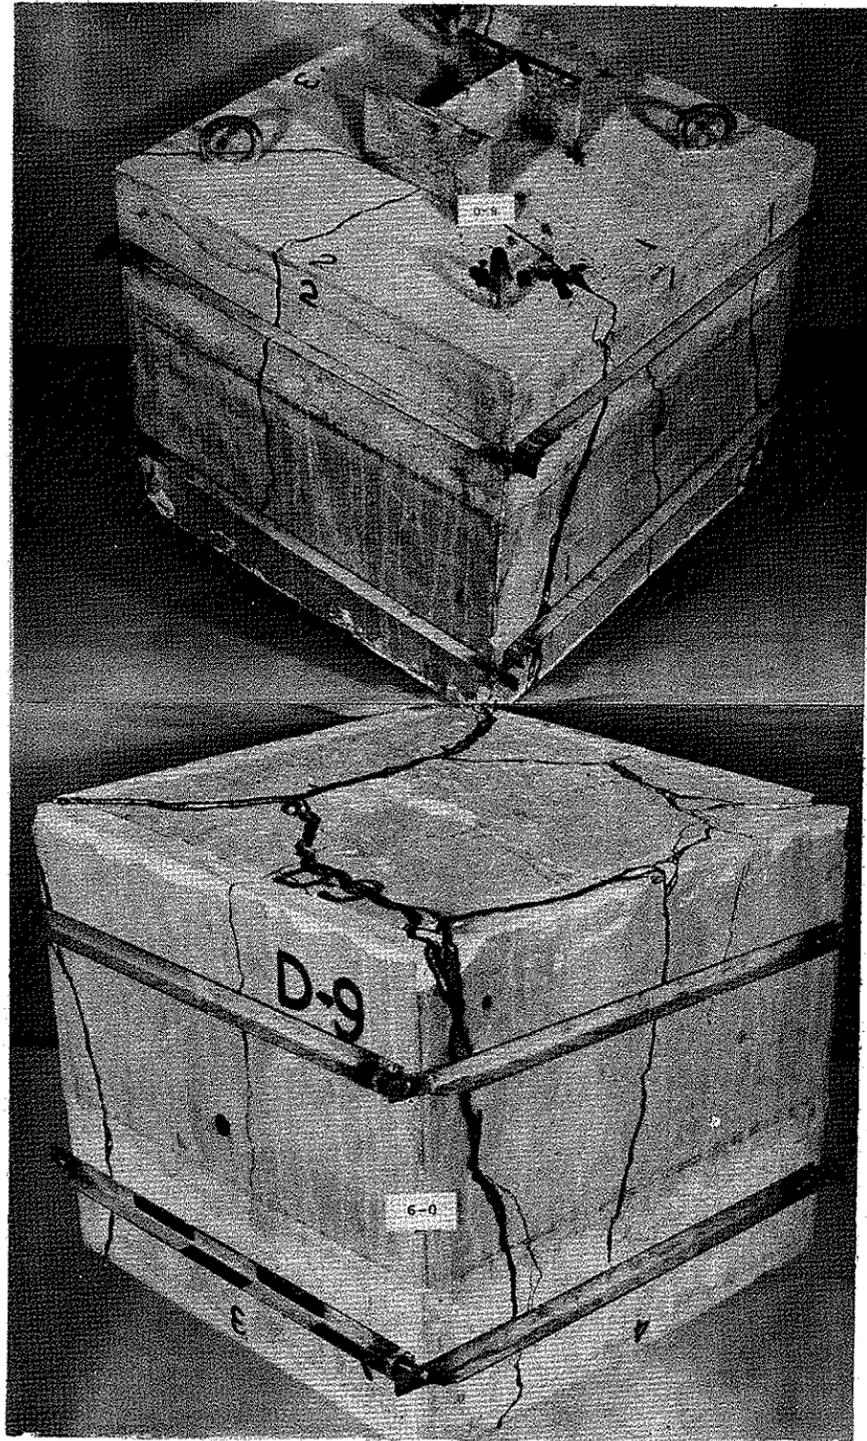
APPEARANCE OF SPECIMEN D-9 AFTER TESTING.)
